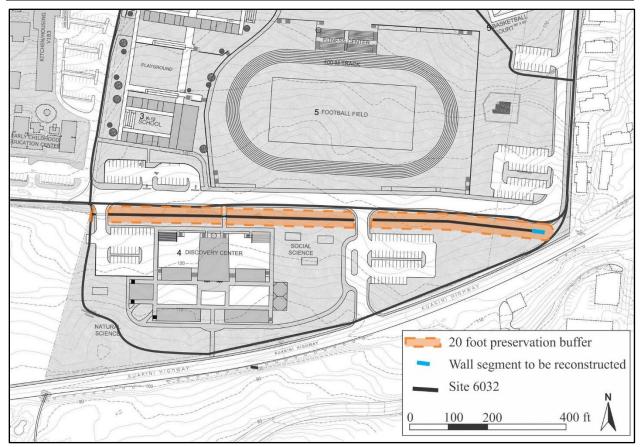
Detail of development plan with Site 6032 and preservation buffer indicated.
